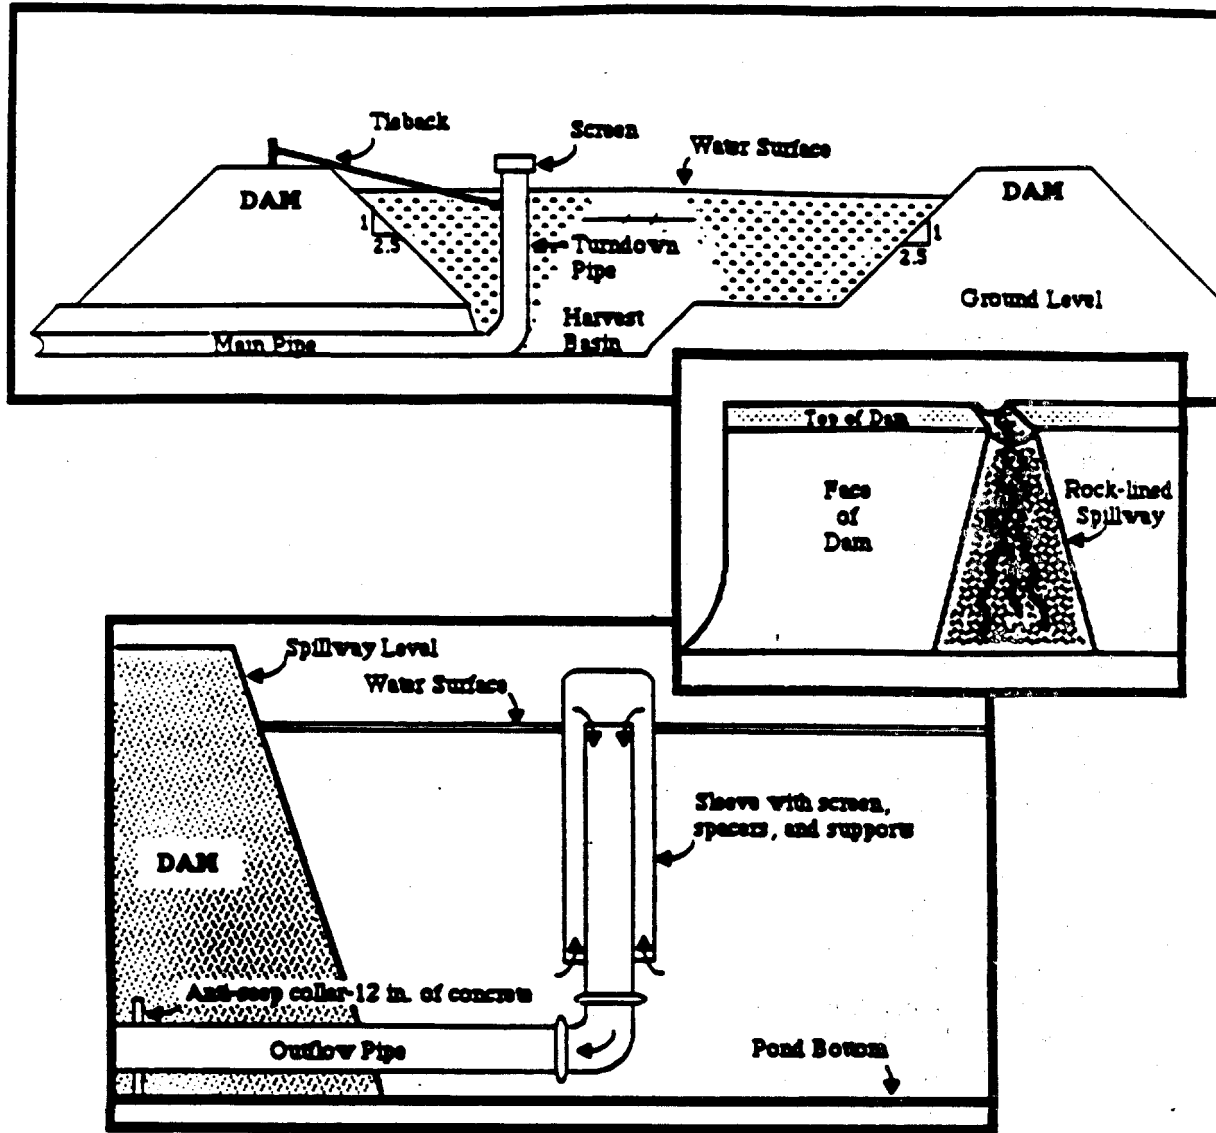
Pond Cross Section, with Details of Spillway and Turndown Pipe
